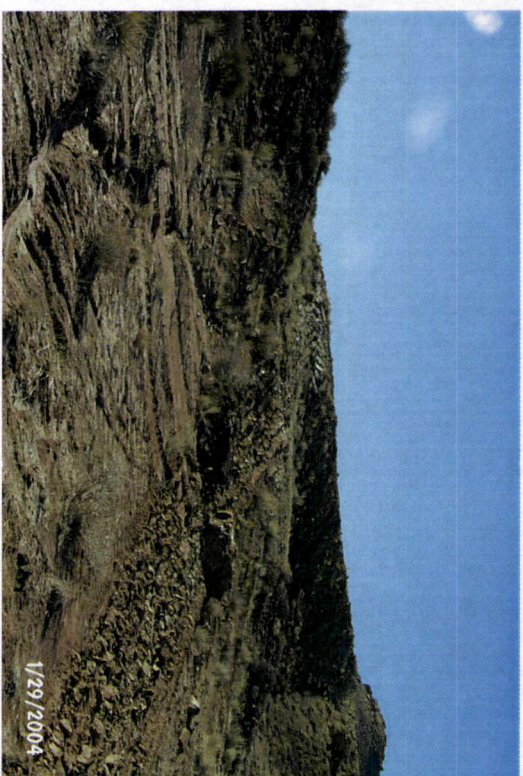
Road leading to one of the vent holes. Note how the road was ripped and roughened, and also note the large rocks in the roadway.
